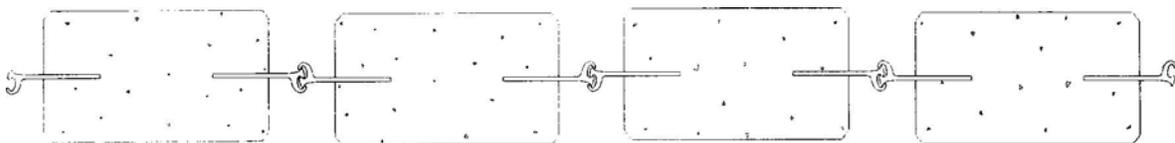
Concrete Sheet Piling with Steel Interlocks.
